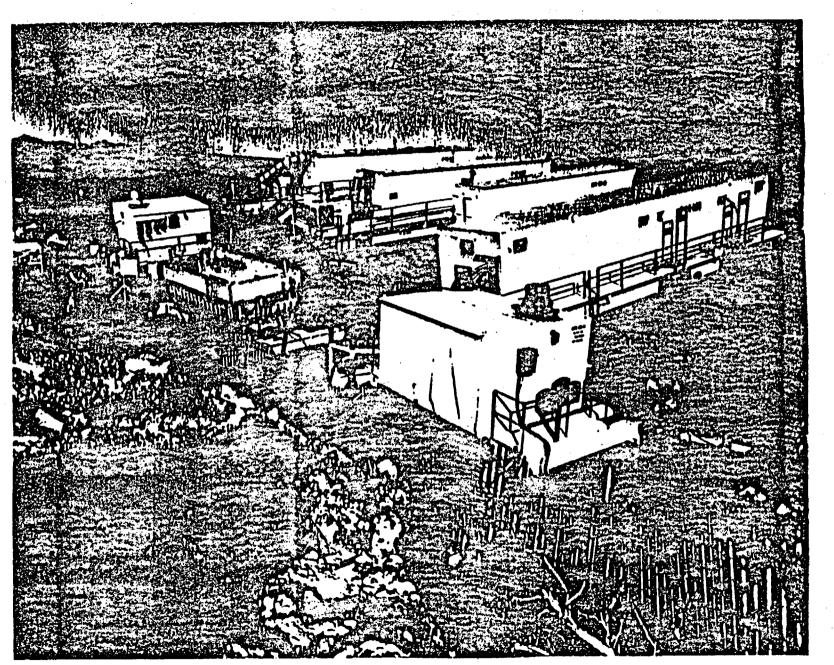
MILAGRO Trailer Park, Post Collapse Damage, Southeast Corner of Anchor Station
